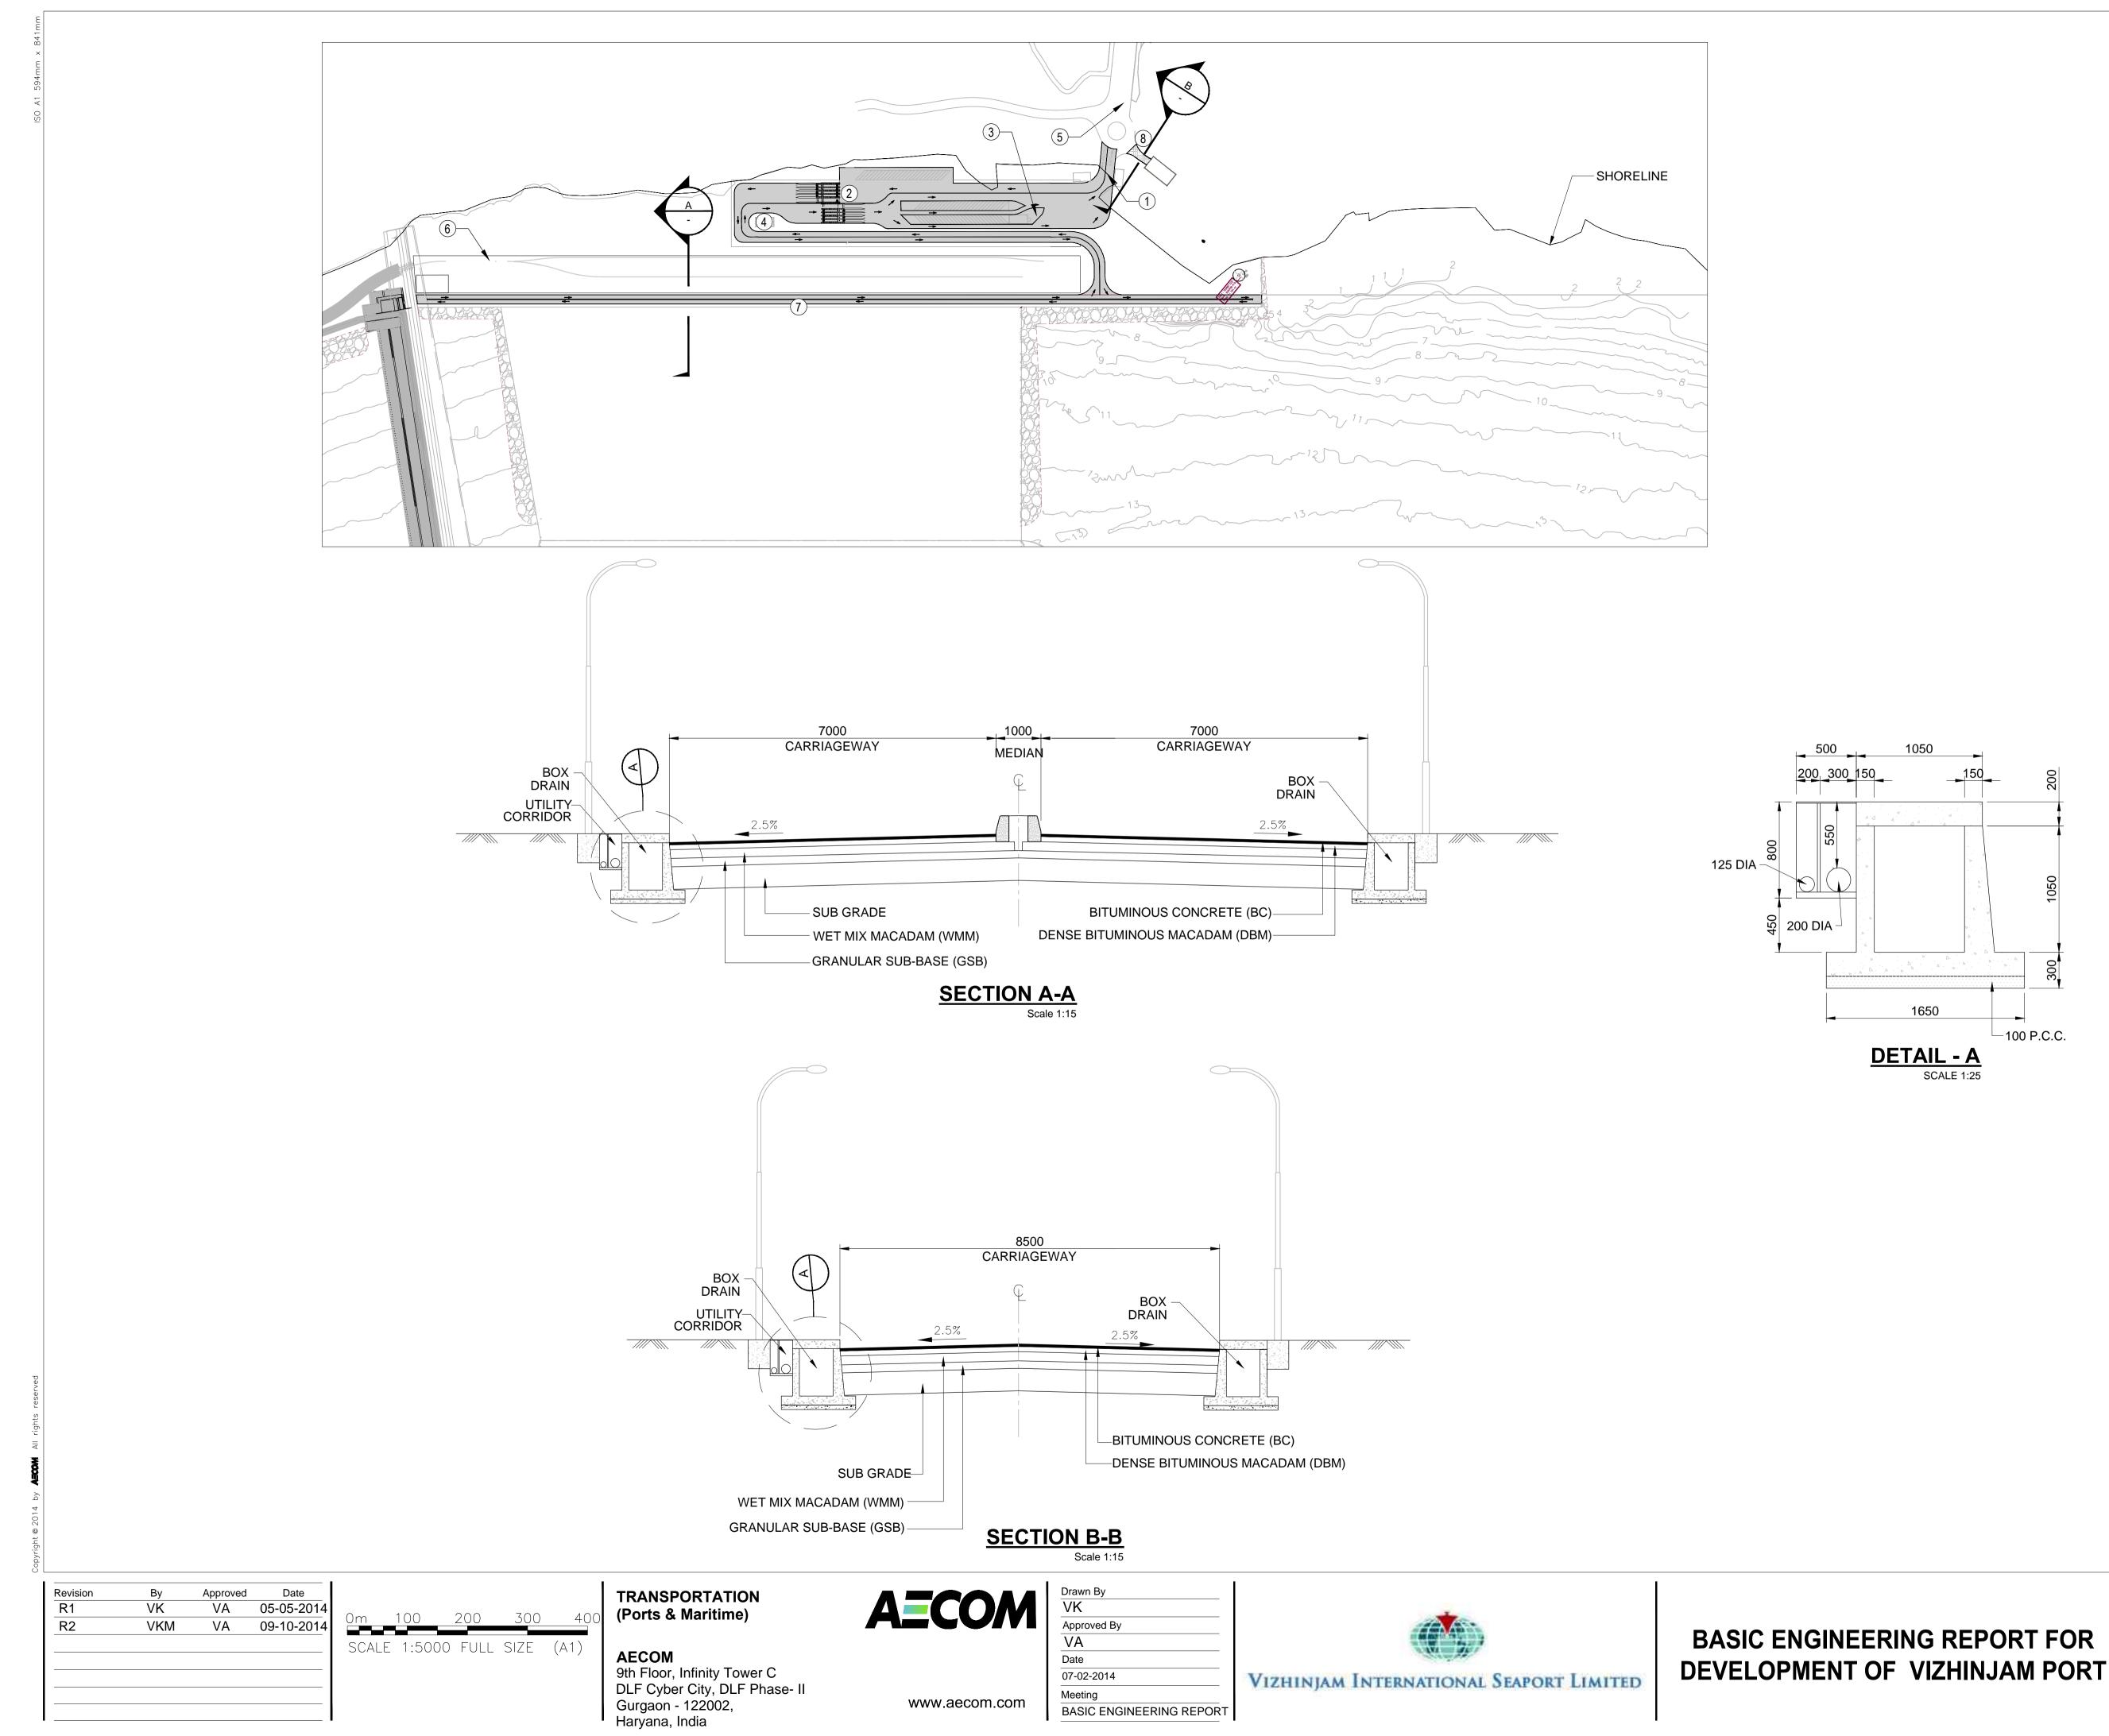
DRG-25-0000-CP- 6001 REV 1
